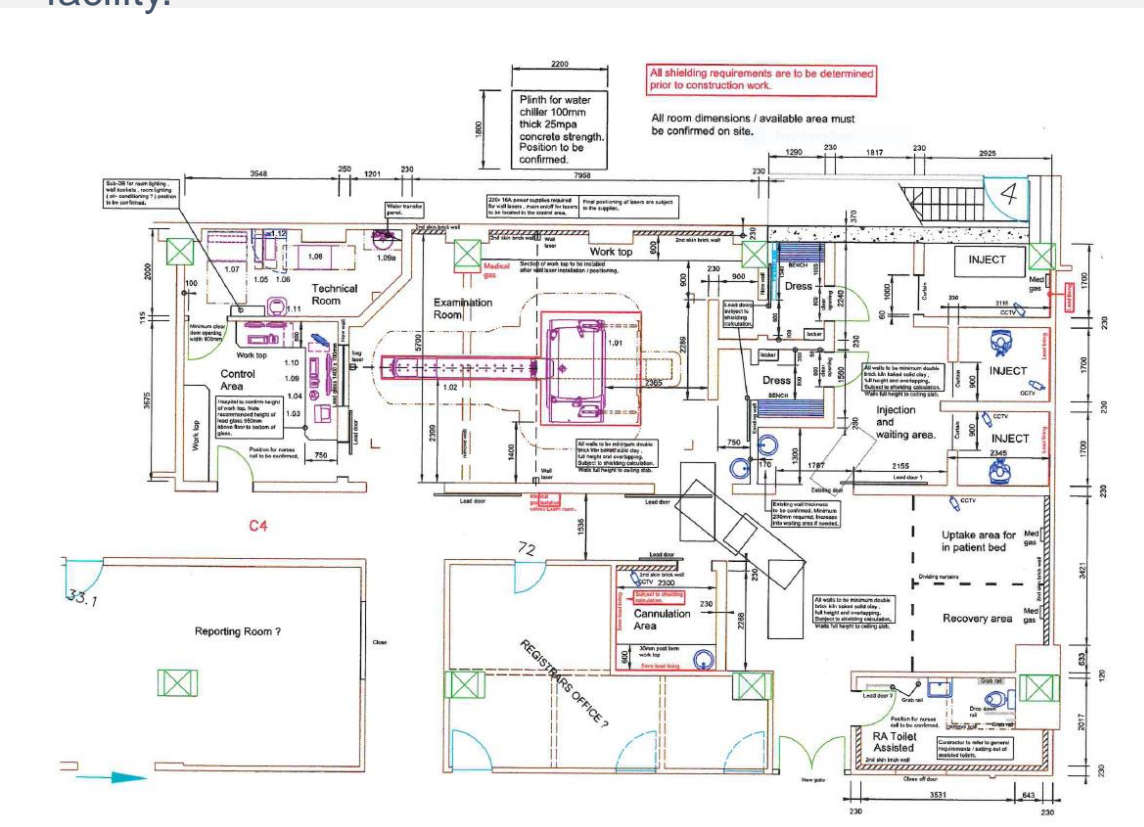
Floor plan of new PET/CT facility rendered by the awarded contractor.
